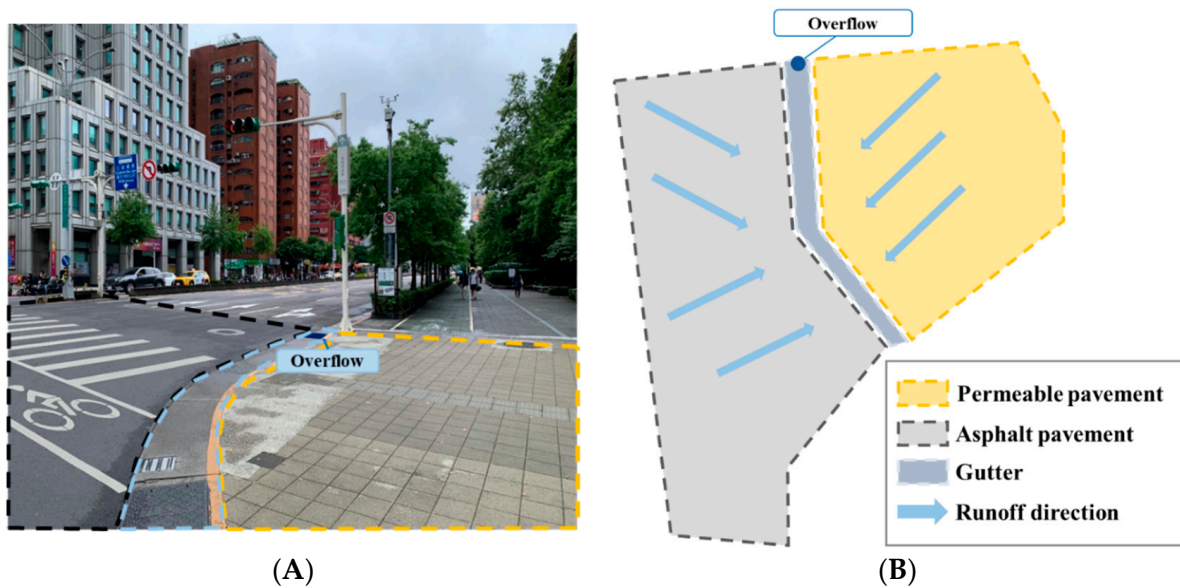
The studied permeable pavement site. (A) Site photo and (B) sketch of the site area.
